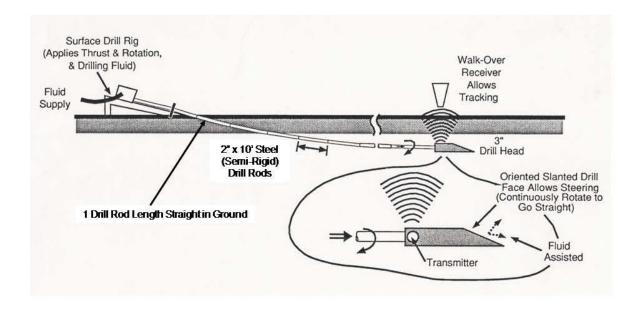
Typical Mini-HDD Equipment and Pilot Boring Process (Source: Outside Plant Consulting Services, Inc.)
